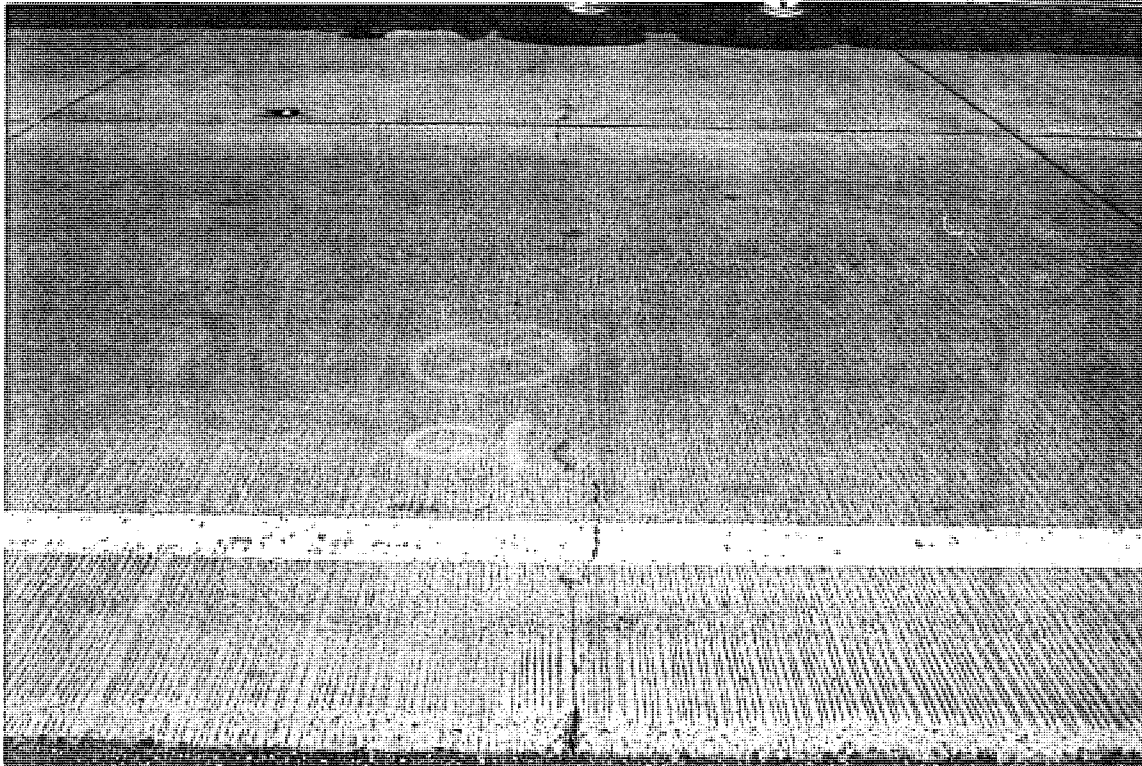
A midslab crack on CSN# 11017-32516A (Section A), EB. The location of core #C1 can also be seen. The crack extends through the passing lane. Transverse joints are spaced at 16 ft.
